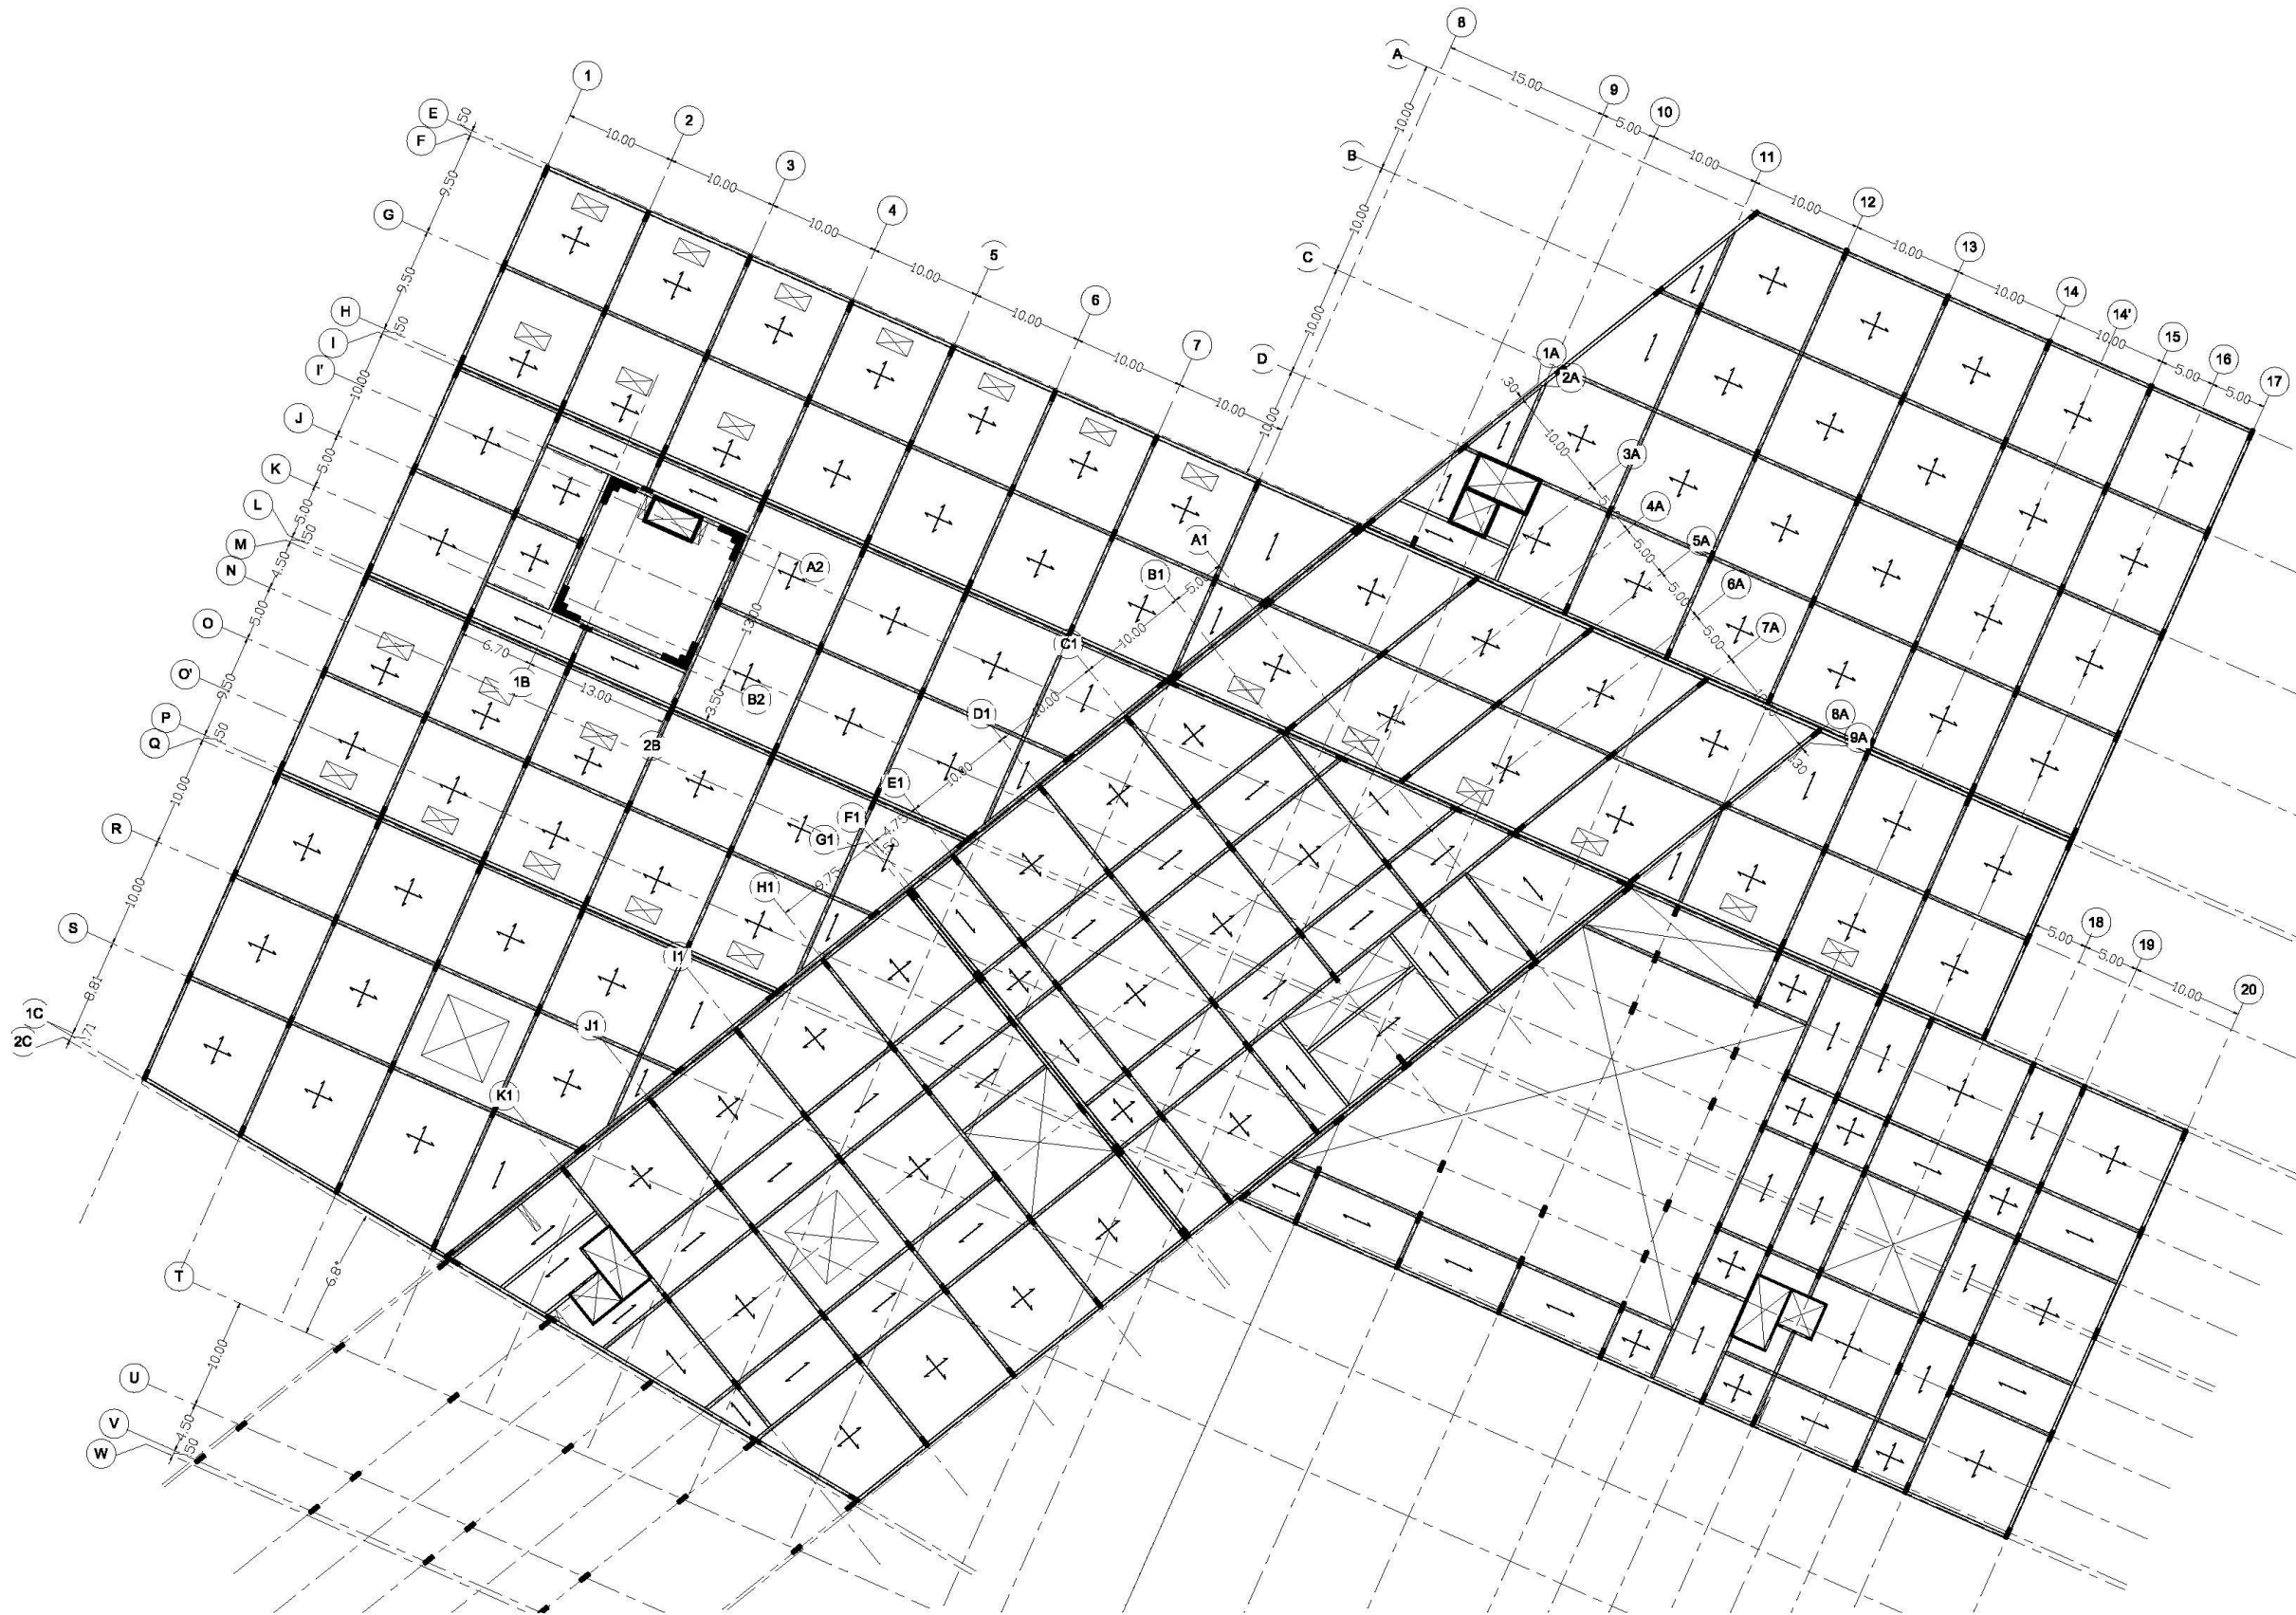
Structural ceiling of level 1 Scale 1-500
